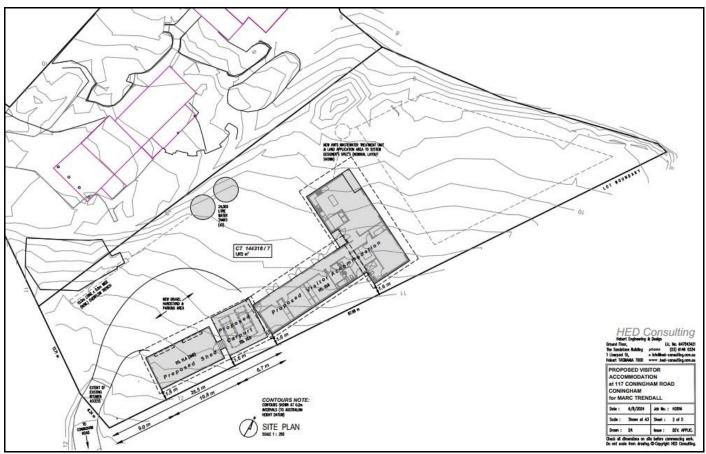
Site plan, 117 Coningham Road, Coningham (Ref – Hobart Engineering & Design Consulting, Proposed Visitor Accommodation at 117 Coningham Road, Coningham for Marc Trendall, Job # H2816).
